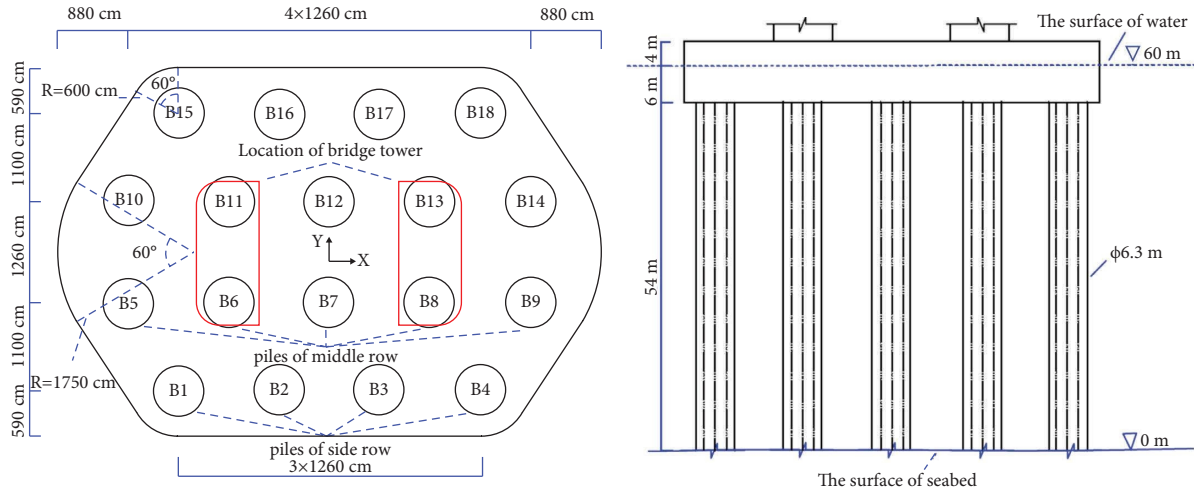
Layout of 60 m deep-water pile-cap foundation of Xihoumen rail-cum-road bridge.
